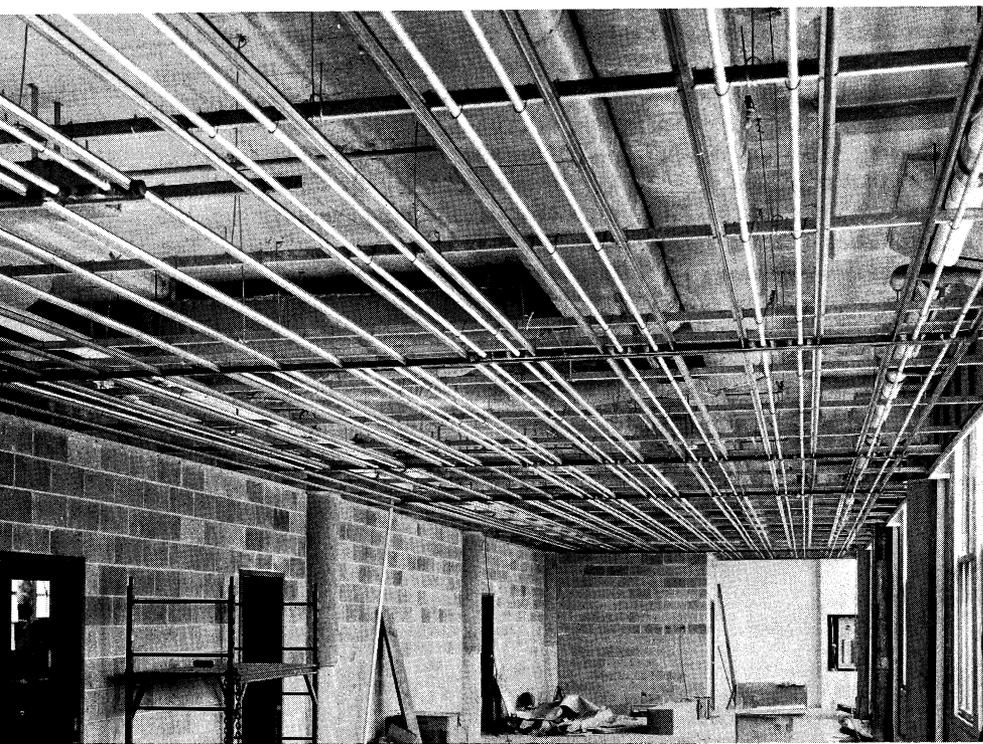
Ceiling Showing Heating and Electrical Conduits (Close Up)
